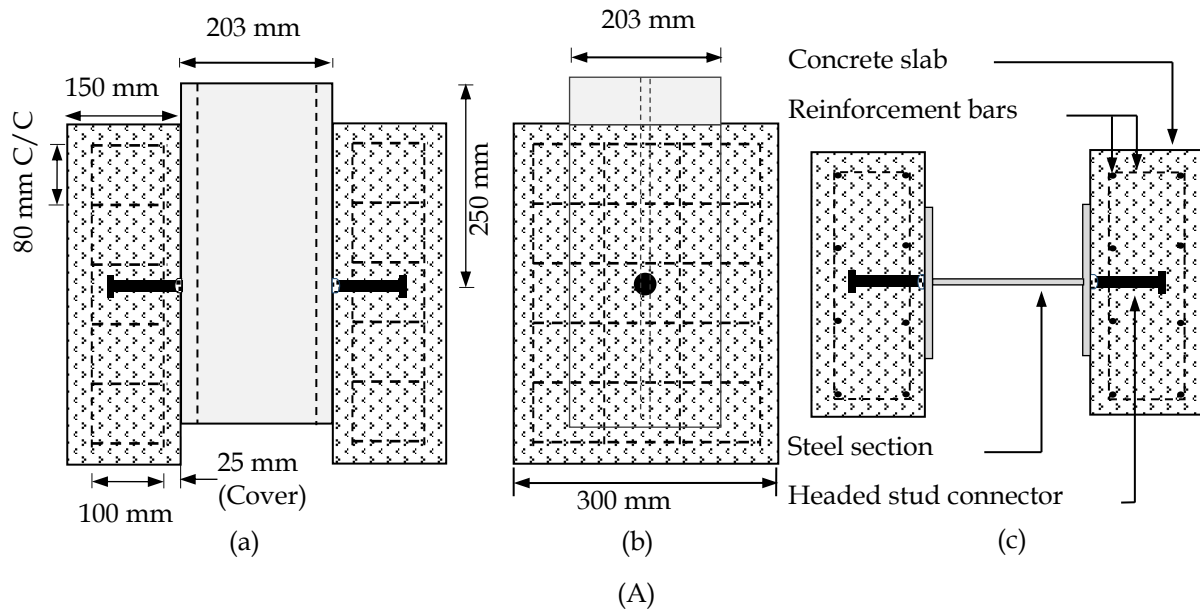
(A): Steel-concrete composite specimen with 100 mm double reinforcement layer cage at 25 mm from root of stud; (a) front view, (b) side view and (c) top view
